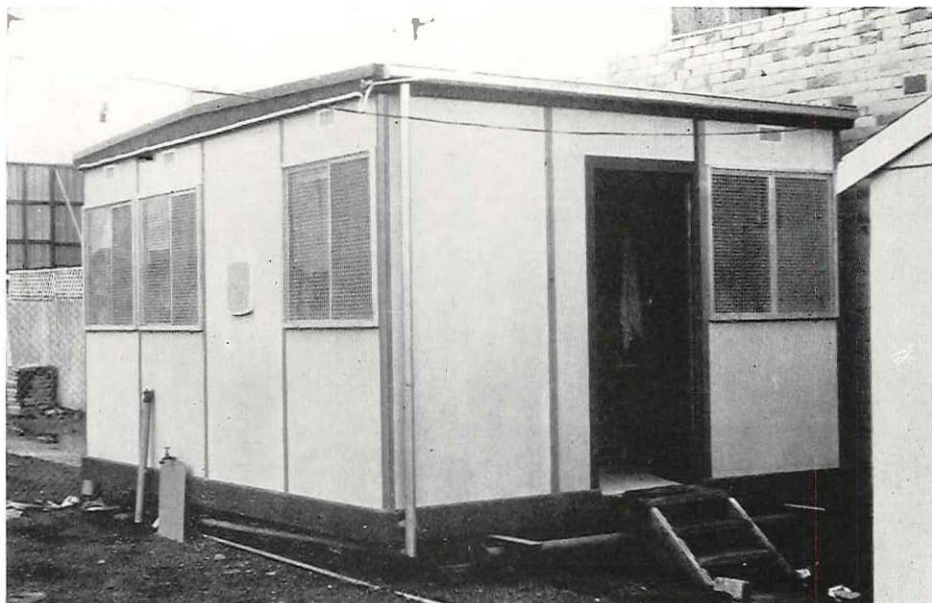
Exterior view of fully transportable laboratory, showing steel sub-frame.
